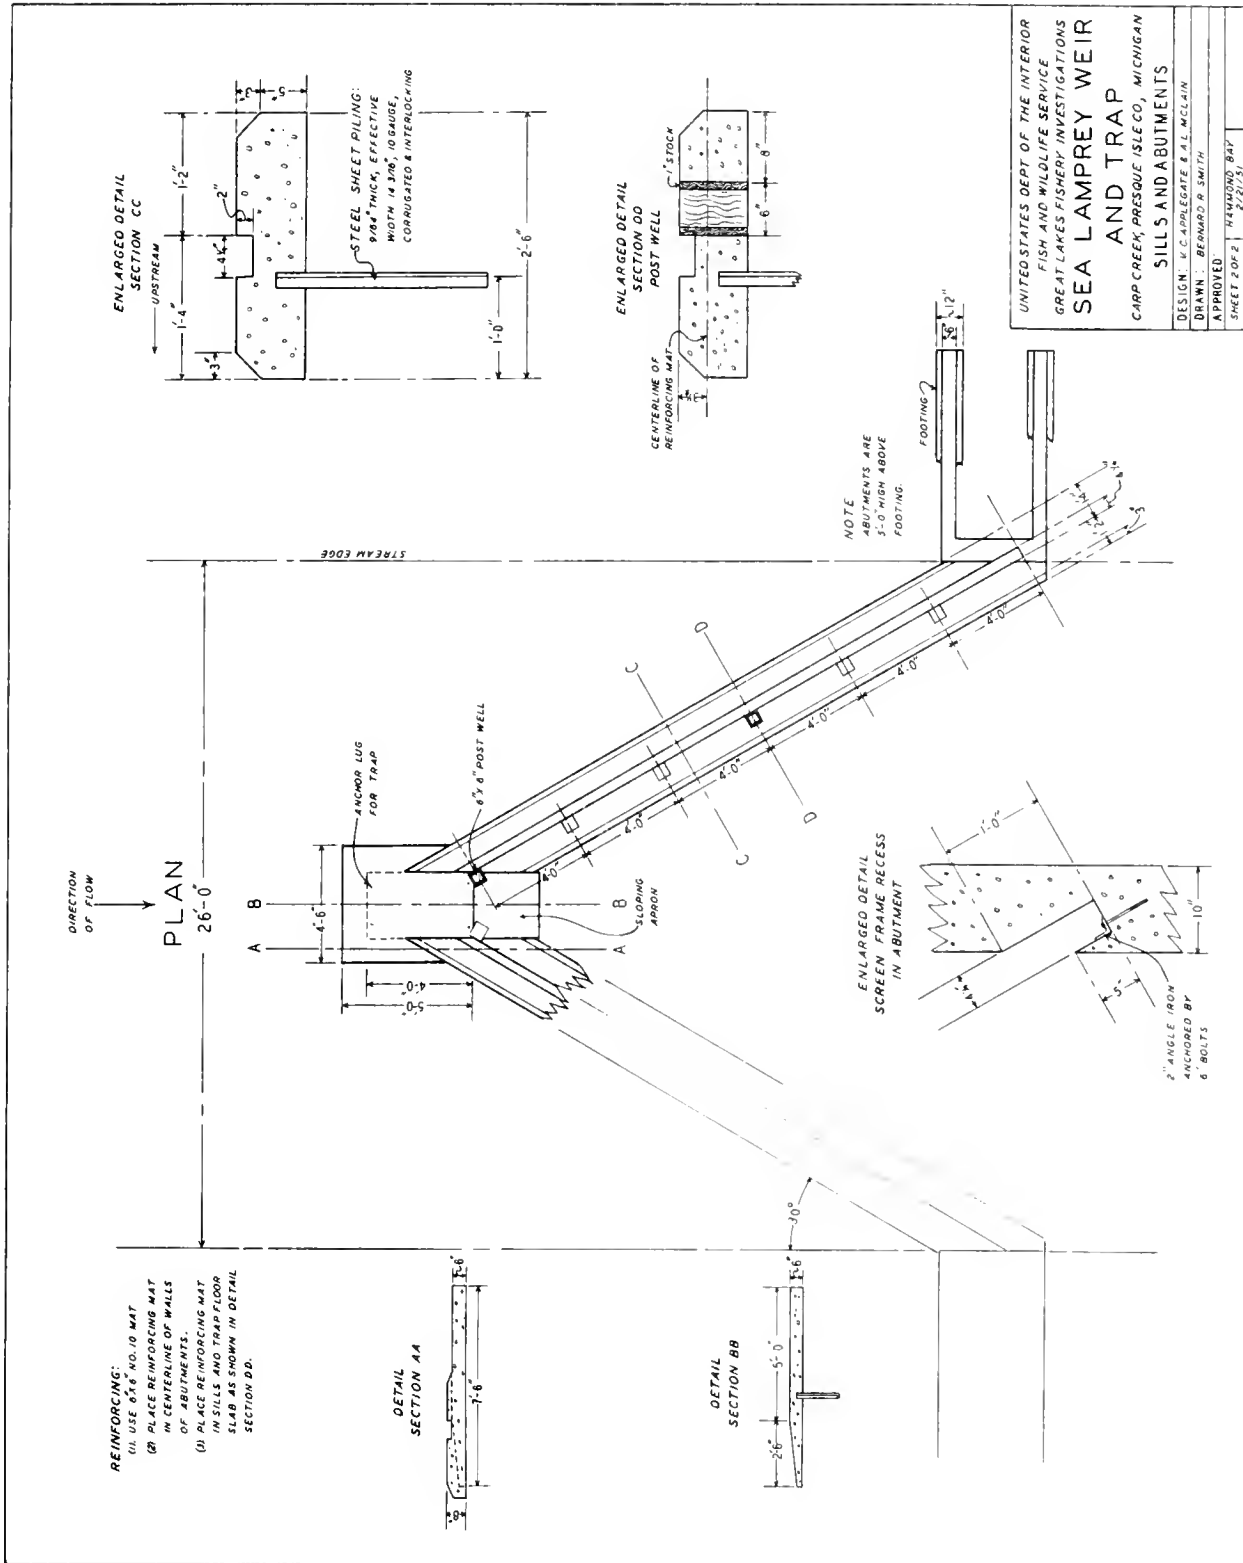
Diagrammatic plans of concrete sills, trap base, and abutments used to provide permanent base for portable-type sea-lamprey weir and trap.
